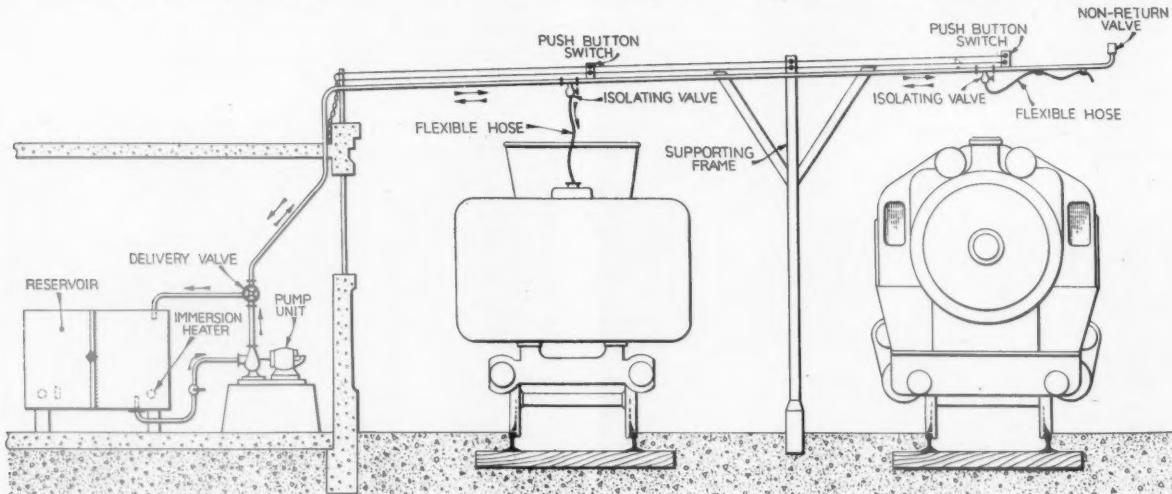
Typical running shed installation, showing layout of feed water treatment equipment
